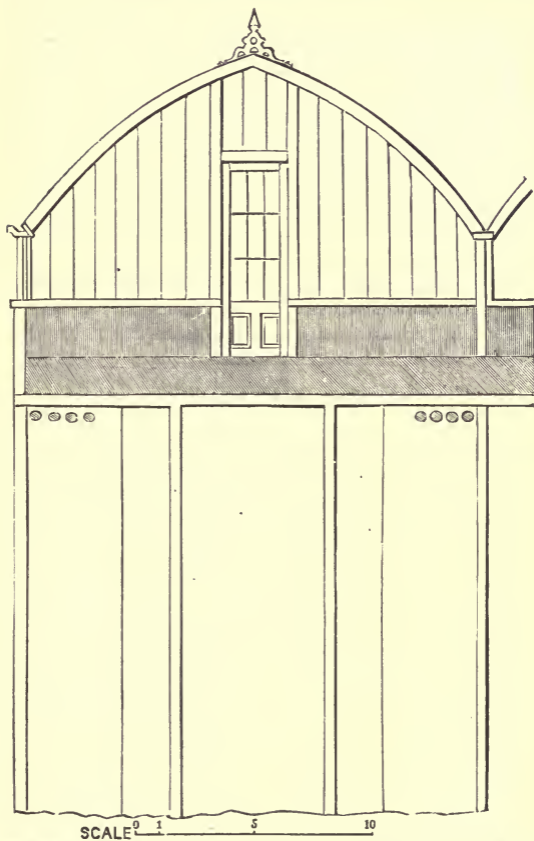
END-VIEW AND PLAN OF DETACHED GREENHOUSE OR GRAPERY.
